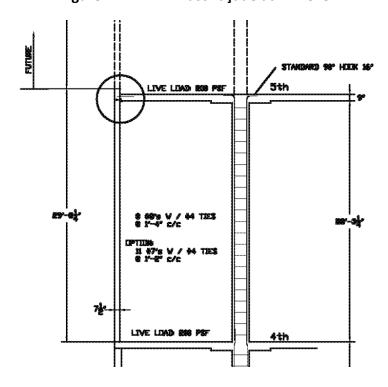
Mill B Precast Wall Panel Connections at 4th Level
